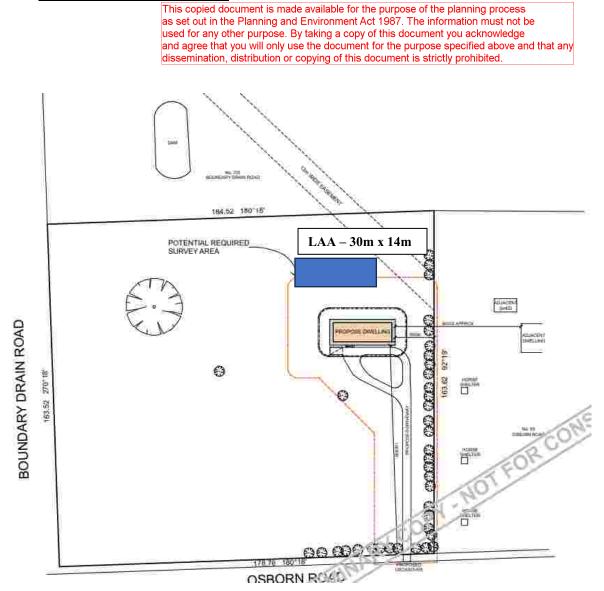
Proposed LAA dimensions, with cut-off drain around high side.
